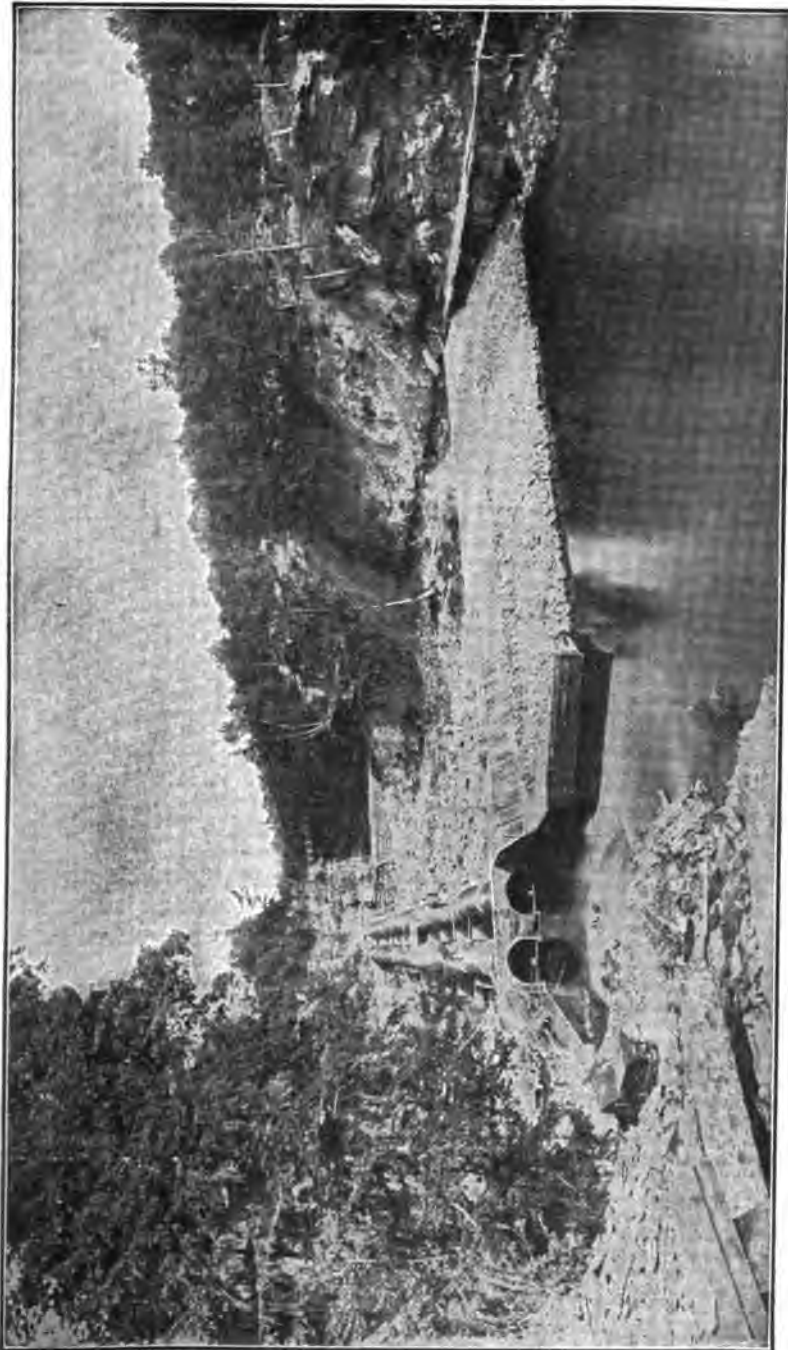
Olive Bridge Dam. View of Gorge of Esopus Creek and Stream Division of 8-foot Pipes to Carry Normal Flow of Esopus Creek over Foundation of Dam.
